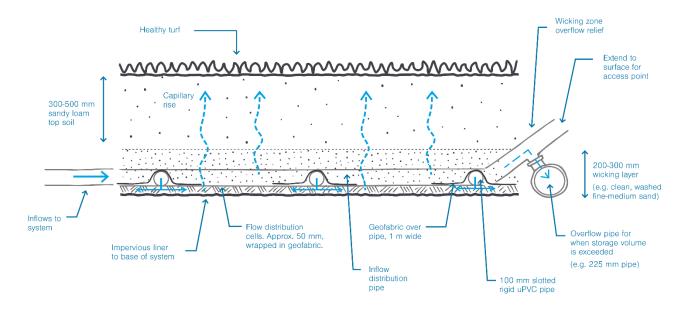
TYPICAL CROSS SECTION THROUGH A WICKING BED PASSIVELY IRRIGATING A TURF OPEN SPACE AREA
